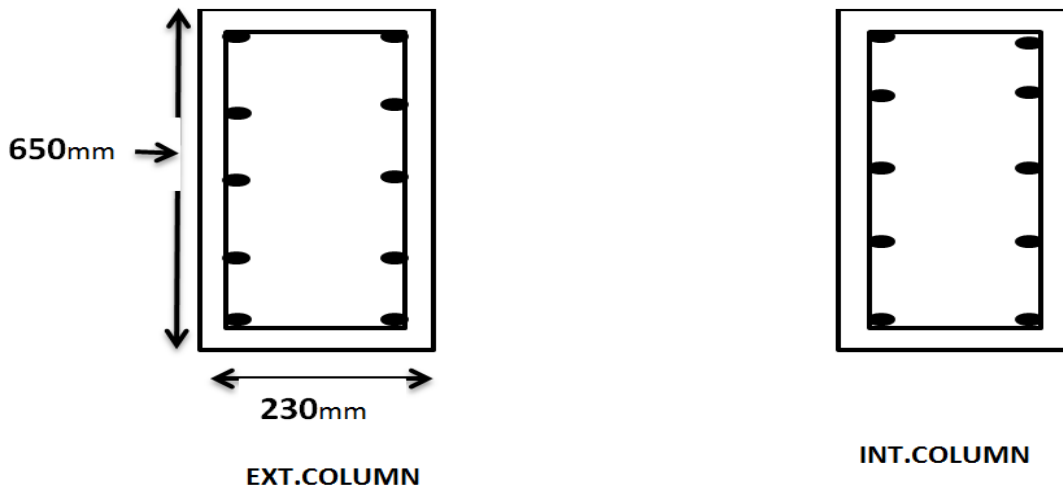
Arrangement of Reinforcement in Exterior and Interior Column
